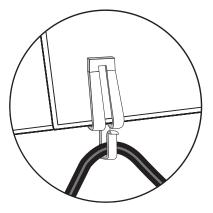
Fixing the clamps to the shingle at the top of the triangle.
